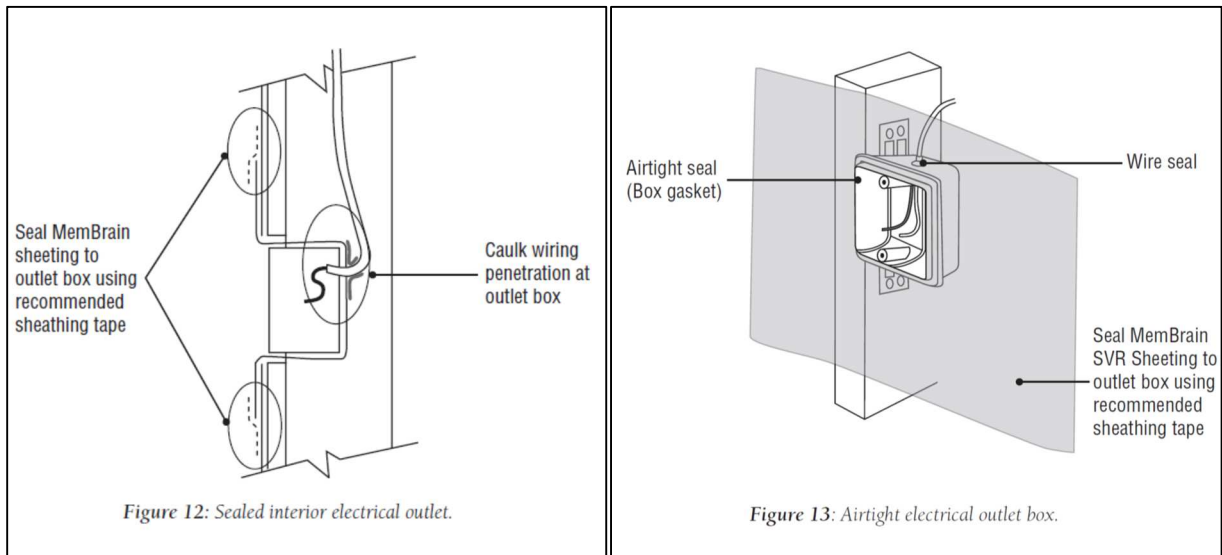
MemBrain attachment detail at electrical outlet and attachment with sheathing tape
